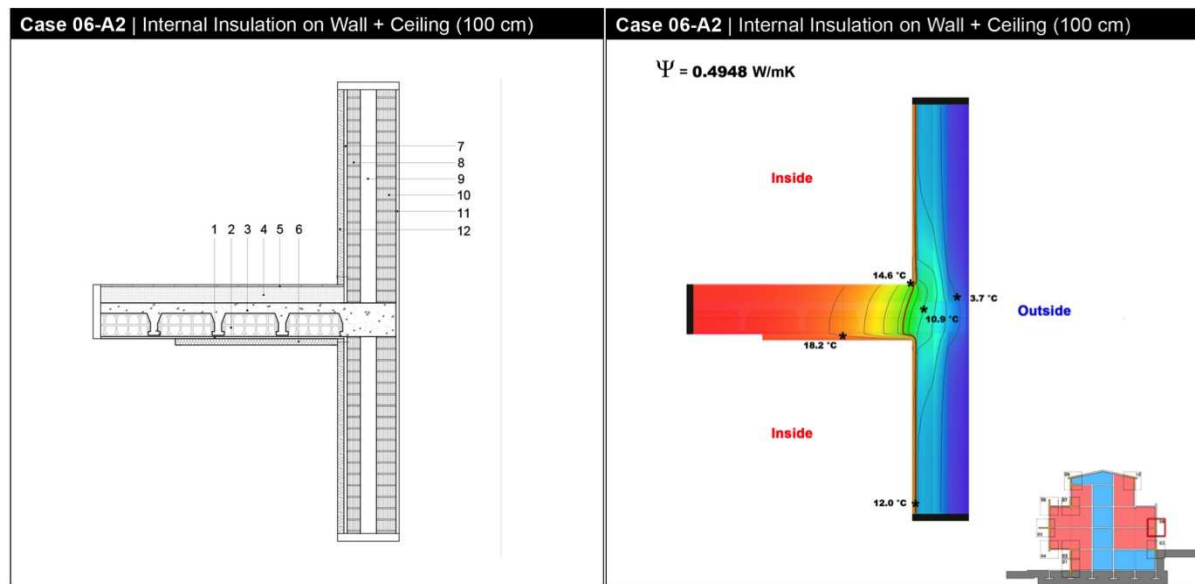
Technological detail and thermal bridge simulation of Case 06-A2 (Internal insulation and 100cm length on the ceiling of the horizontal slab).
